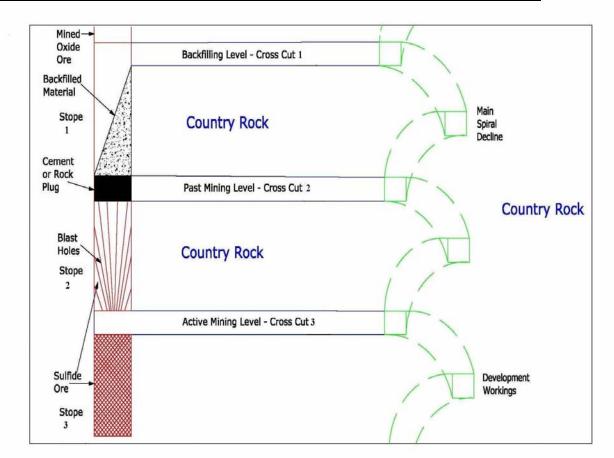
Typical Cross-Section Illustrating Sub-Level Stoping Mining Method.
